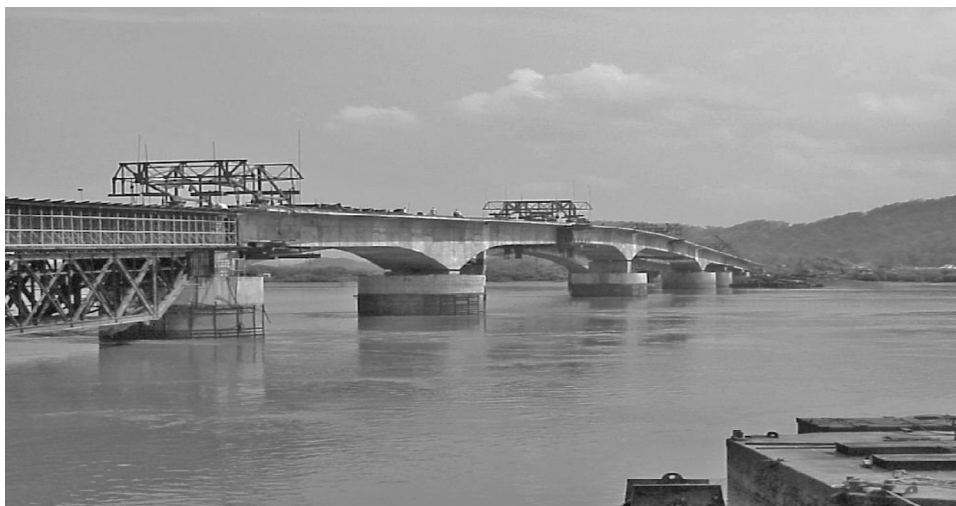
The general arrangement of the Second Bassein Creek Bridge, Mumbai, India
